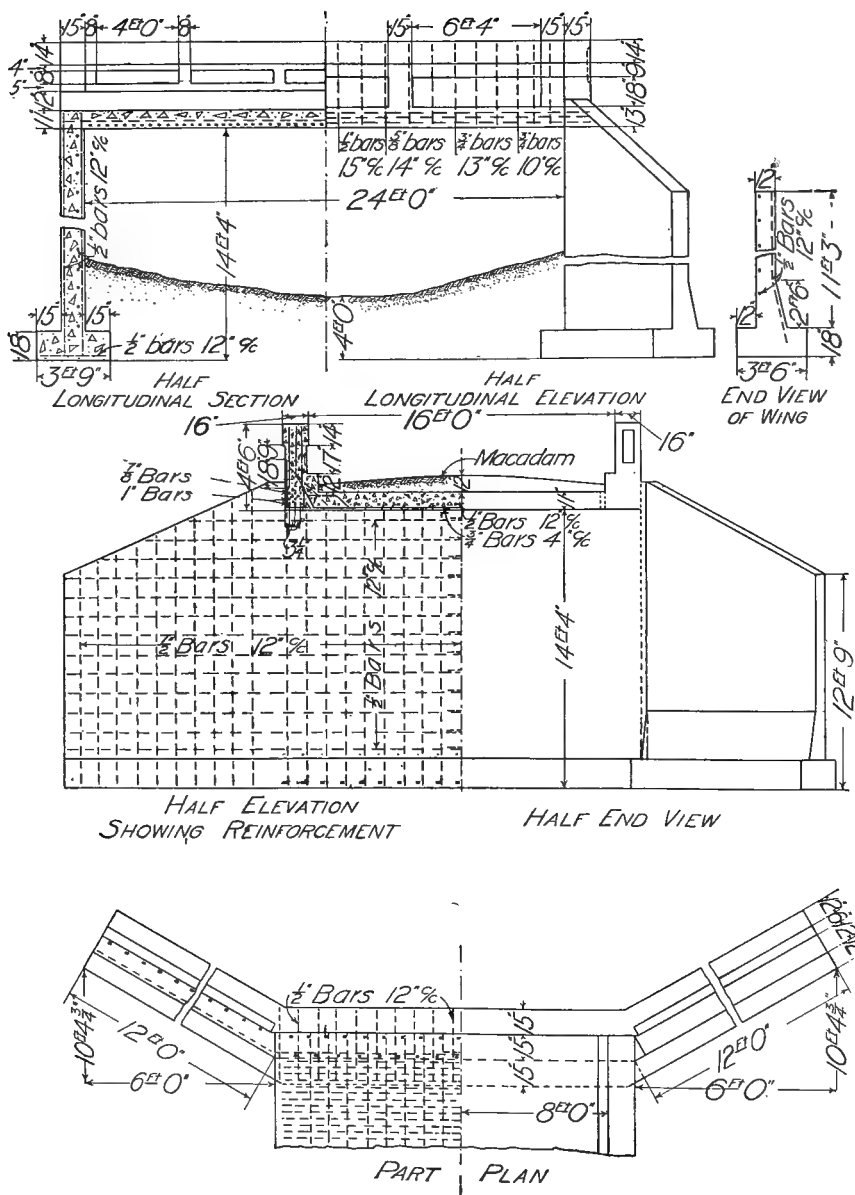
SLAB BRIDGE WITH SPAN OF 24 FEET. ,
